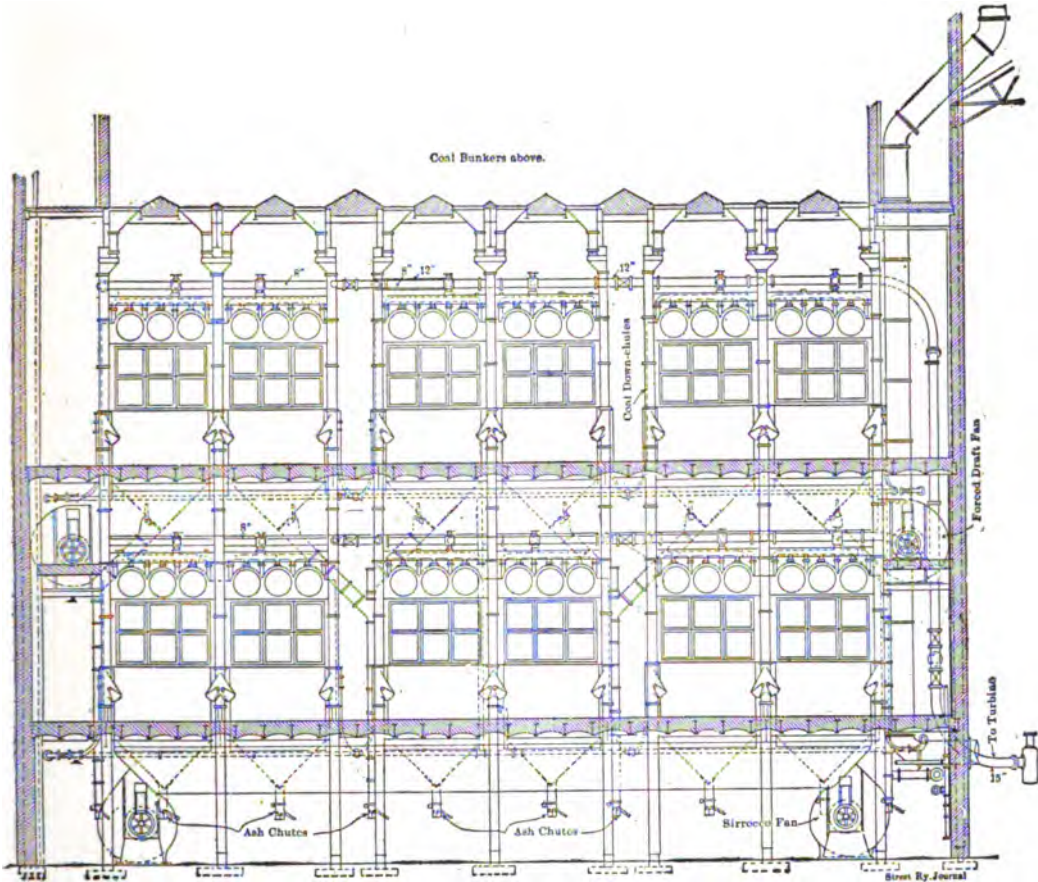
Longitudinal Section of Boiler Room, Williamsburg Plant, Brooklyn, showing Coal and Ash Chutes.
